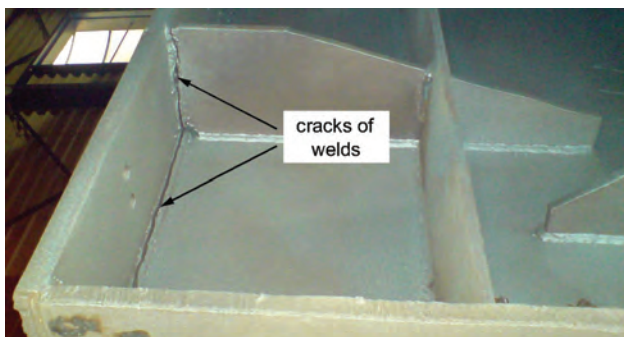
Cracks in welds connecting the front plate and the webs and ribs found in one of the crane beams
